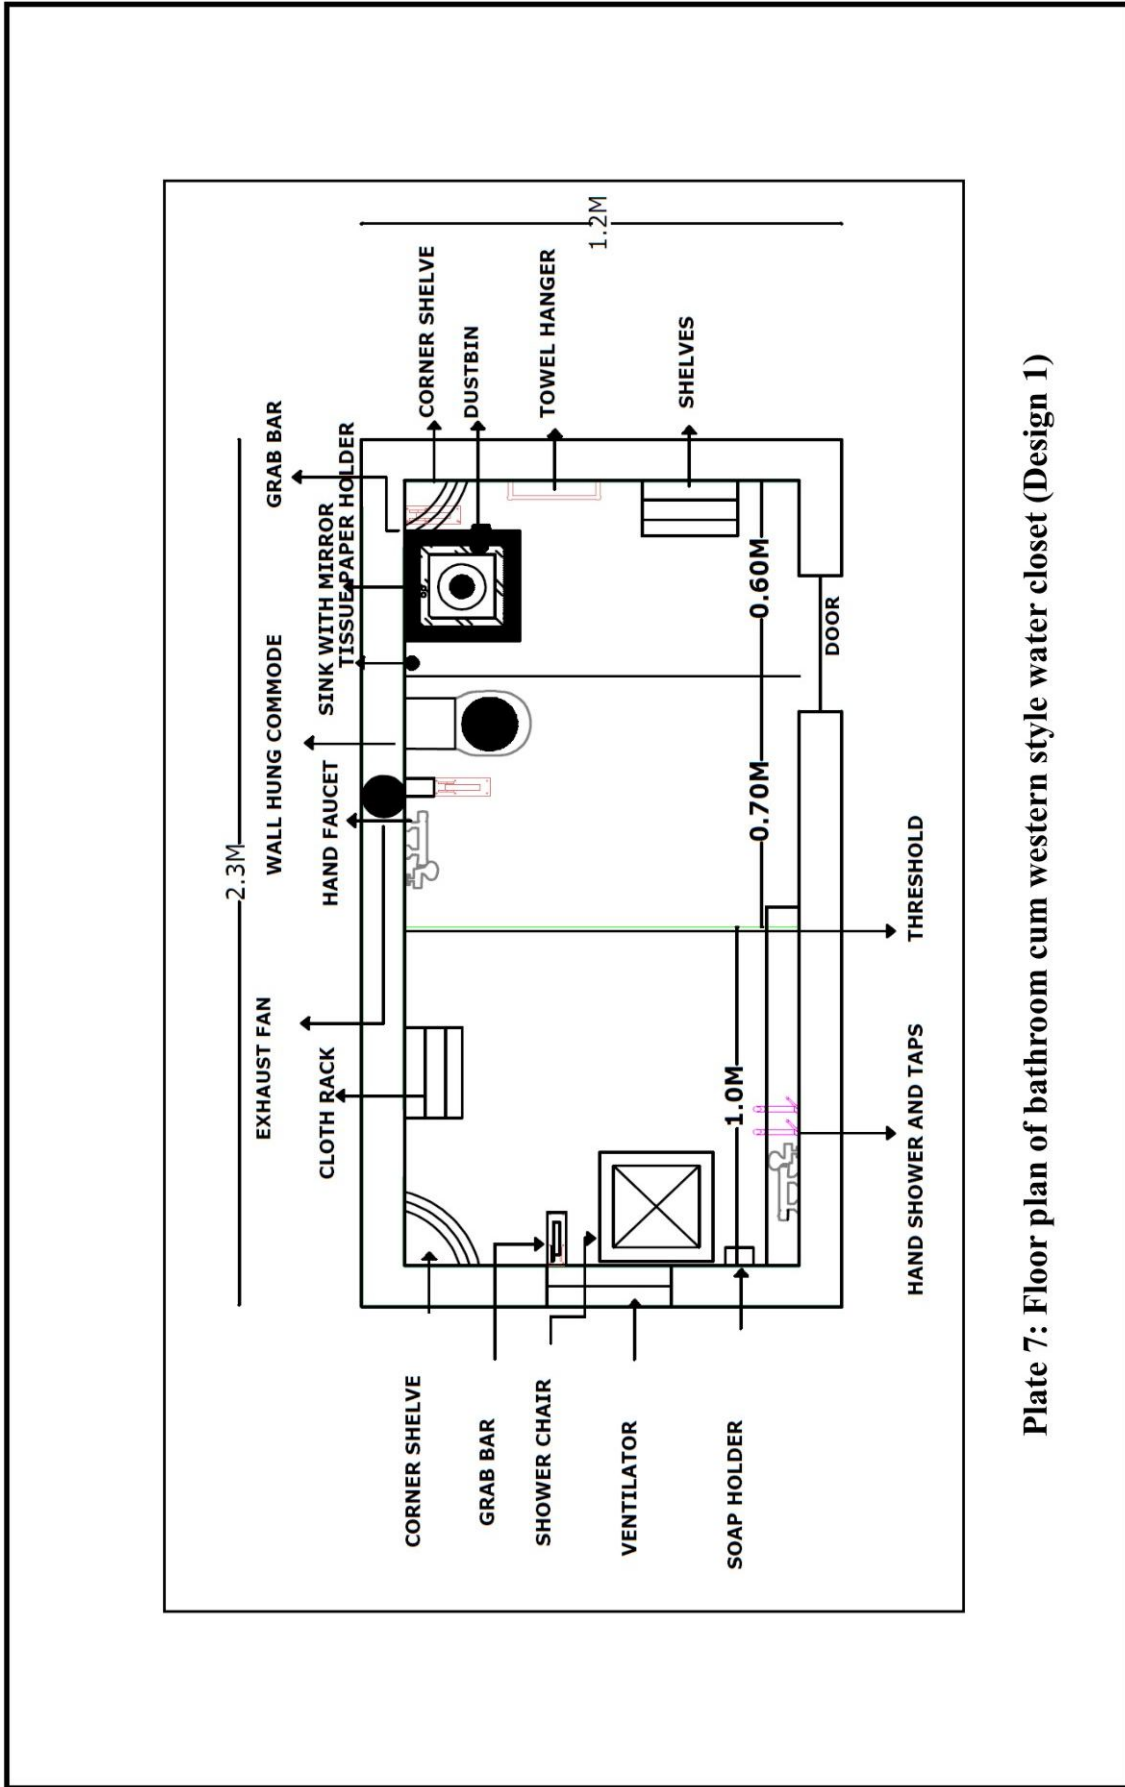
Floor plan of bathroom cum western style water closet (Design 1)
